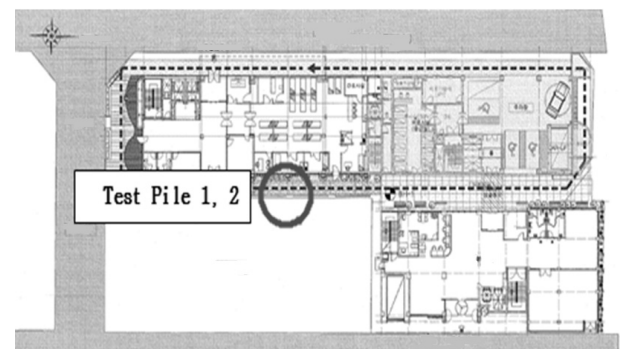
Drawings of static load test of the pressure penetrating steel pipe pile
